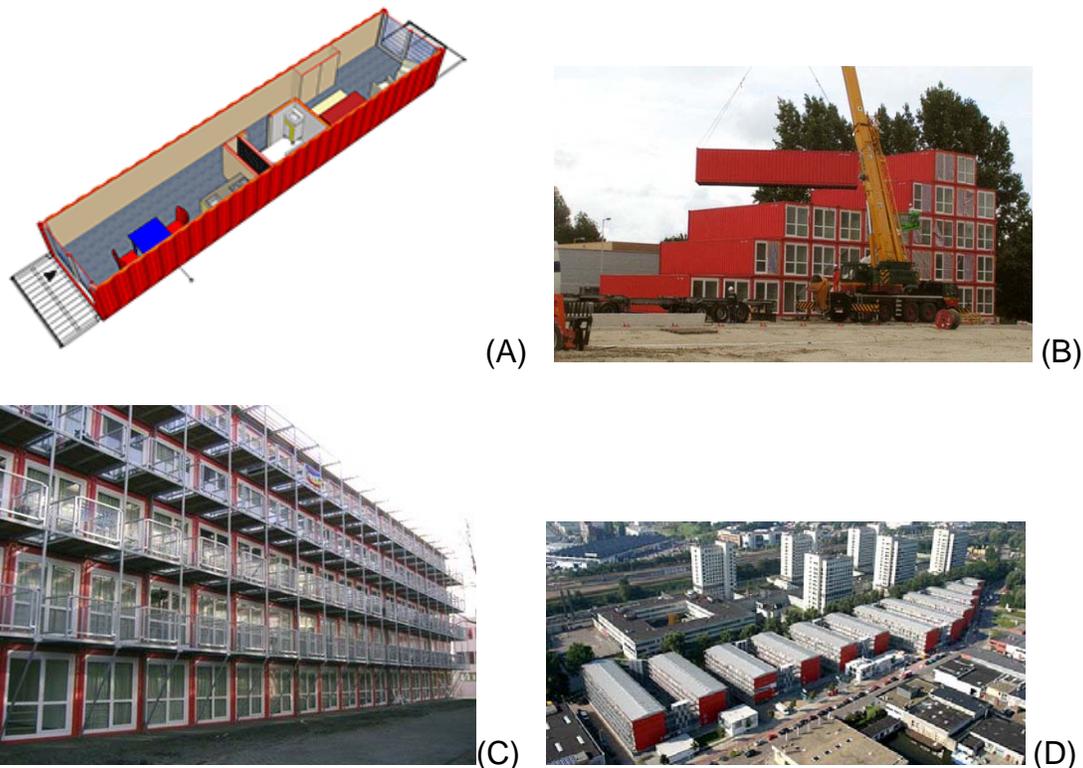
Keetwonen (Kimberley, 2010). (A) Modular ISBU, (B) Elevating the first 60 dormitory units into place, (C) Completed building unit with balcony attachments installed, (D) Aerial view of 1,000 unit complex.
